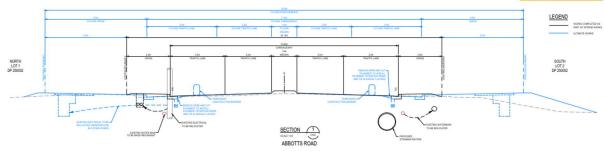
Typical section of the proposed upgrade of Abbotts Road
